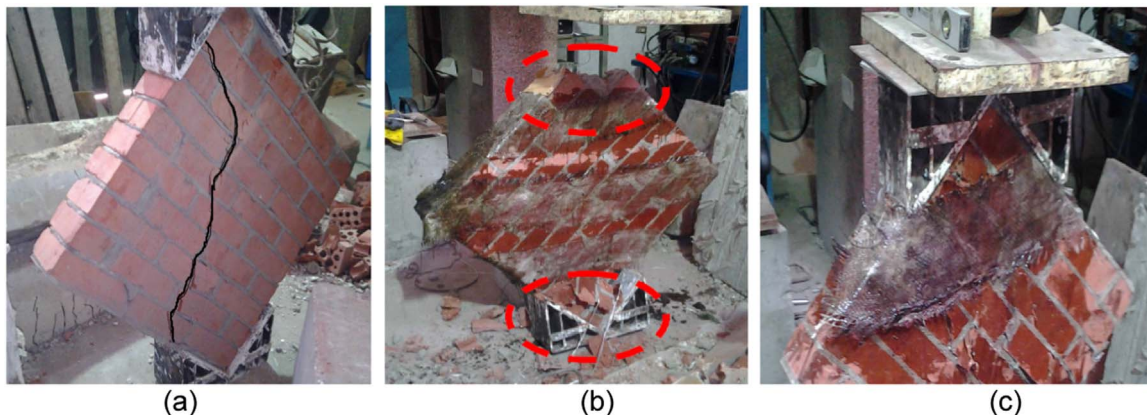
Walllets failure mode a) unstrengthened, b) and c) walllets strengthened by GFRP.
